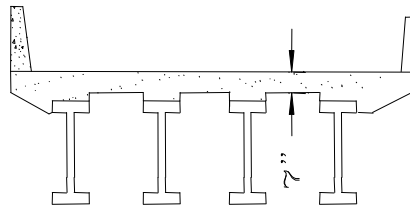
Cross-section of bridge showing four girders located at 9' on center
